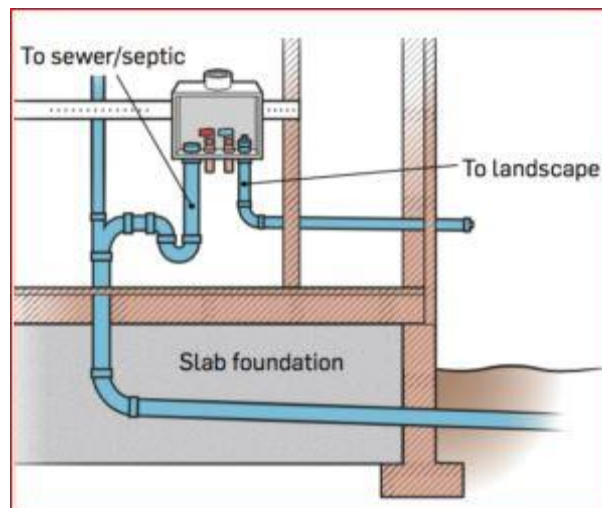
Illustration of installing greywater pipes(Allen, 2018)
